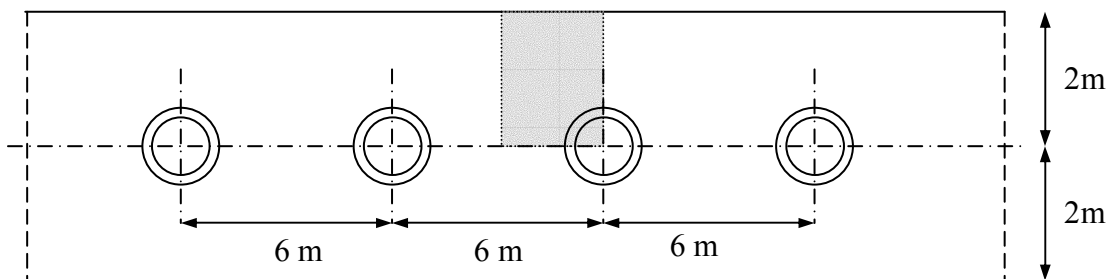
Schematic plan view of tunnel floor used for the generalised 3D model (not to scale).
